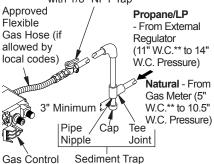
Attaching Flexible Gas Line to Control Valve (Remote-Ready Models)
